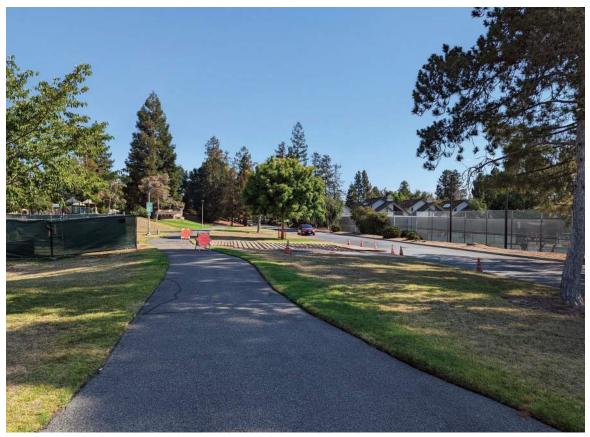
View from the southeast corner of the project site looking north towards Anton Way.
